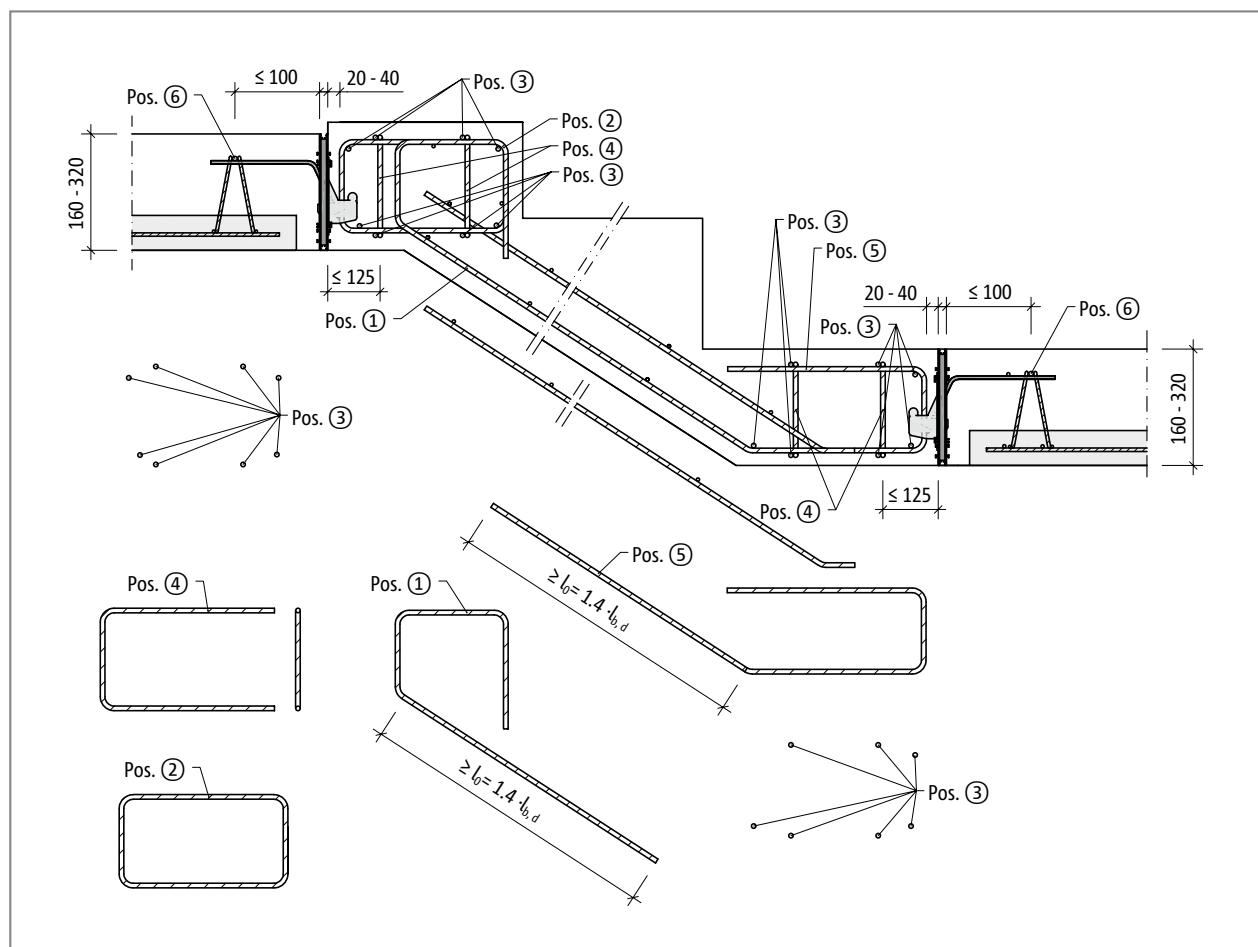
Schöck Tronsole® type T: On-site reinforcement with precast landing
